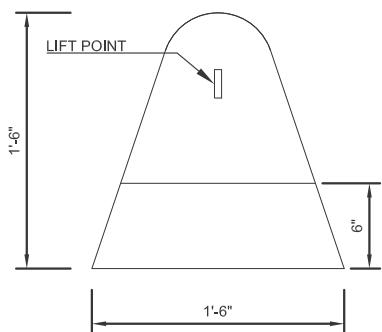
Low Barrier Wall project example in Boulder, CO, end view detail.
